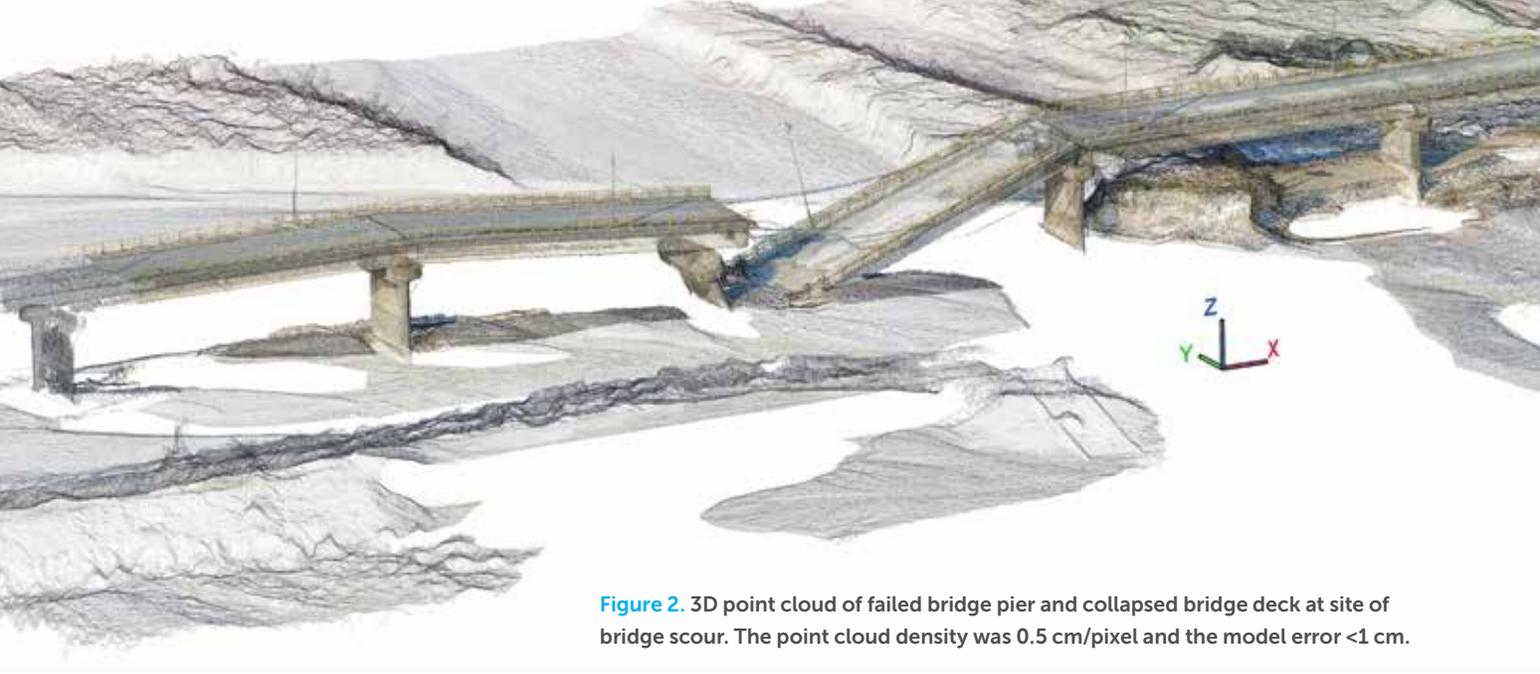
3D point cloud of failed bridge pier and collapsed bridge deck at site of bridge scour. The point cloud density was 0.5 cm/pixel and the model error <1 cm.
